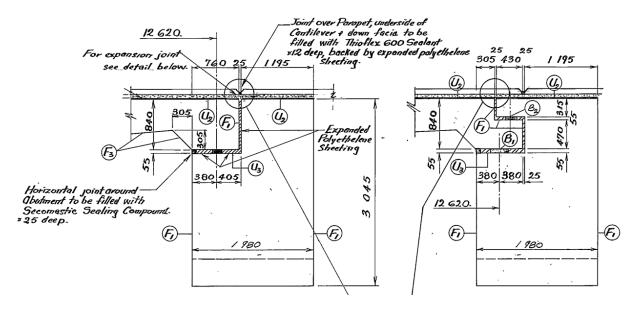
Reinforced concrete abutment (Extract from Record Drawing ER6D/S73/1)
